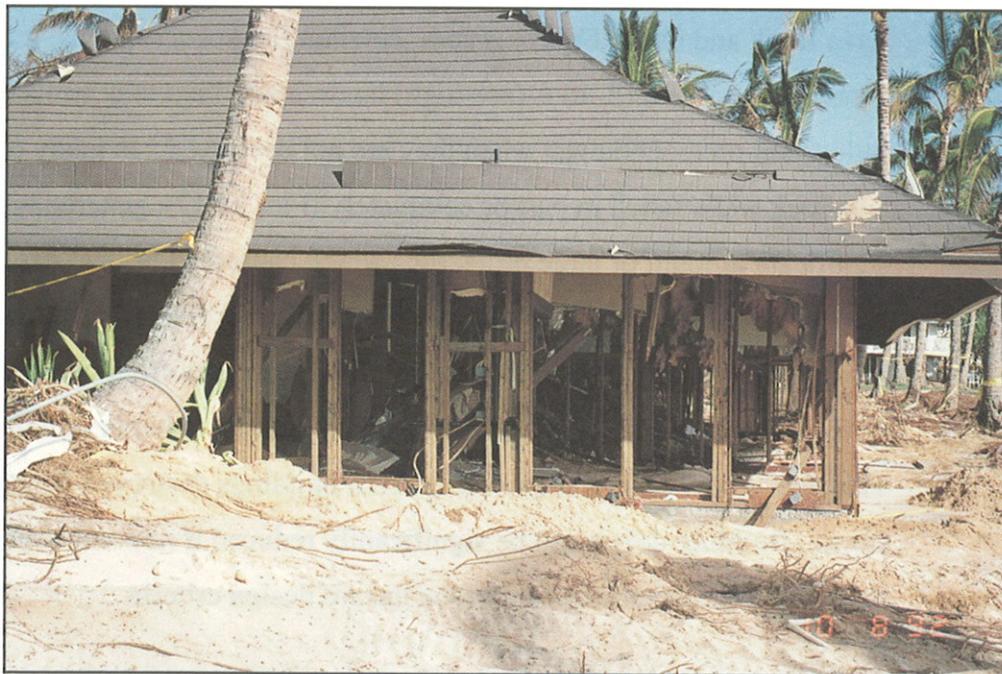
Interior of non-elevated building at Poipu Beach destroyed by coastal flooding.
